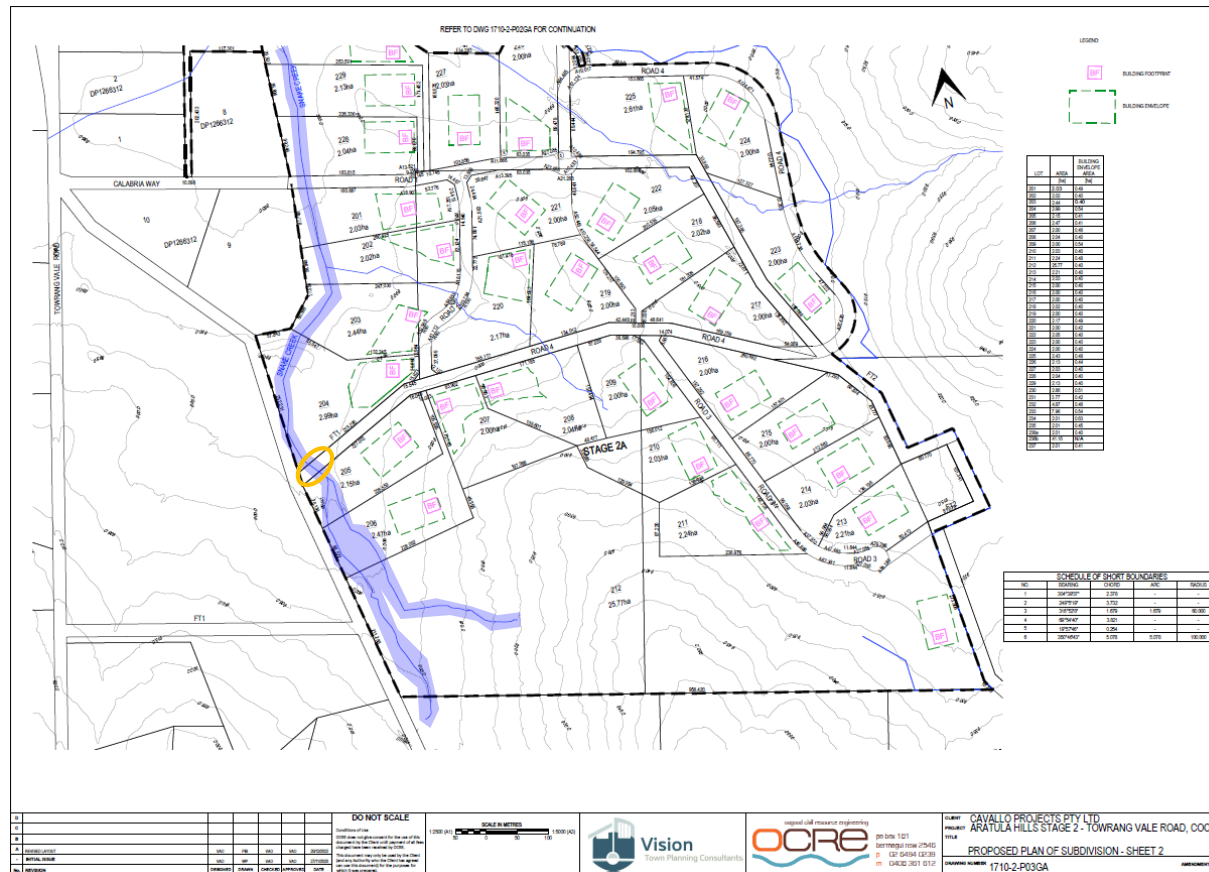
Building footprint (BF) and building envelopes (outlined in green) within each proposed lot. Snake Creek Conservation Area shaded blue.
